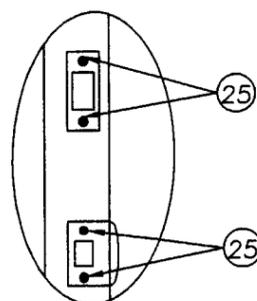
DETAIL F HEADER WINDJAMBER ASTRAGAL RETAINER BOLTS HEADER STRIKE PLATE
